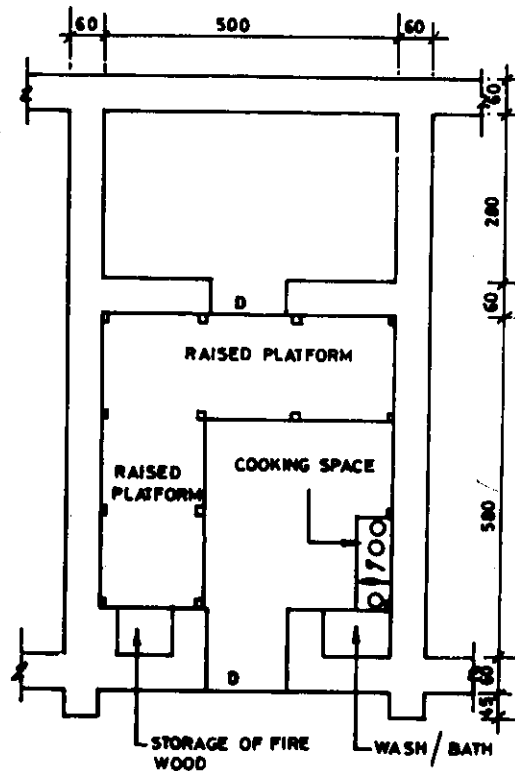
TYPICAL PLAN OF A HOUSE IN LATUR DISTRICT
